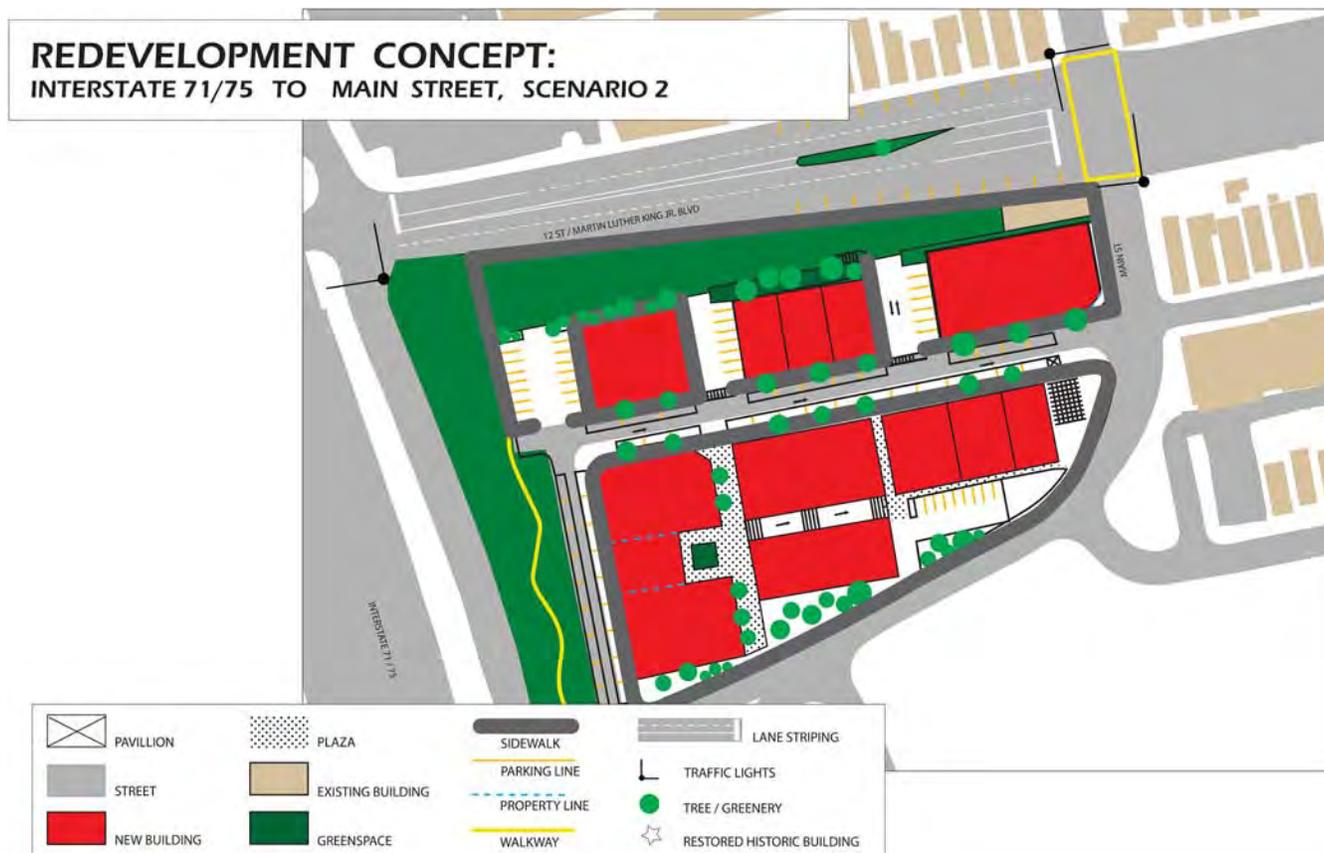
Redevelopment Design Concept - Interstate 71/75 to Main Street
